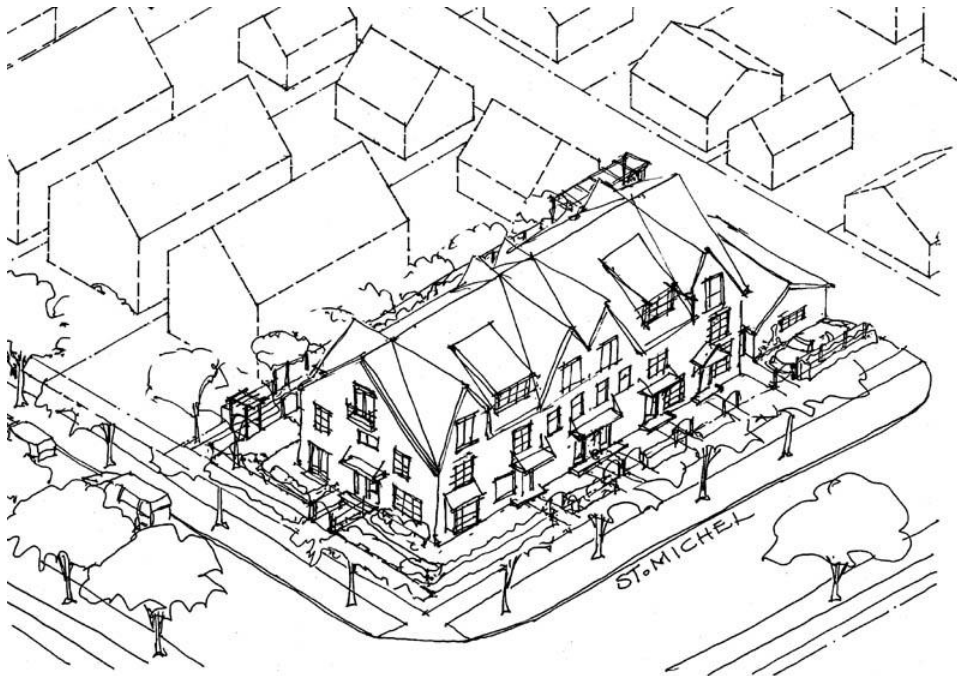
Rowhouse-Townhouse – Corner Lot Option
